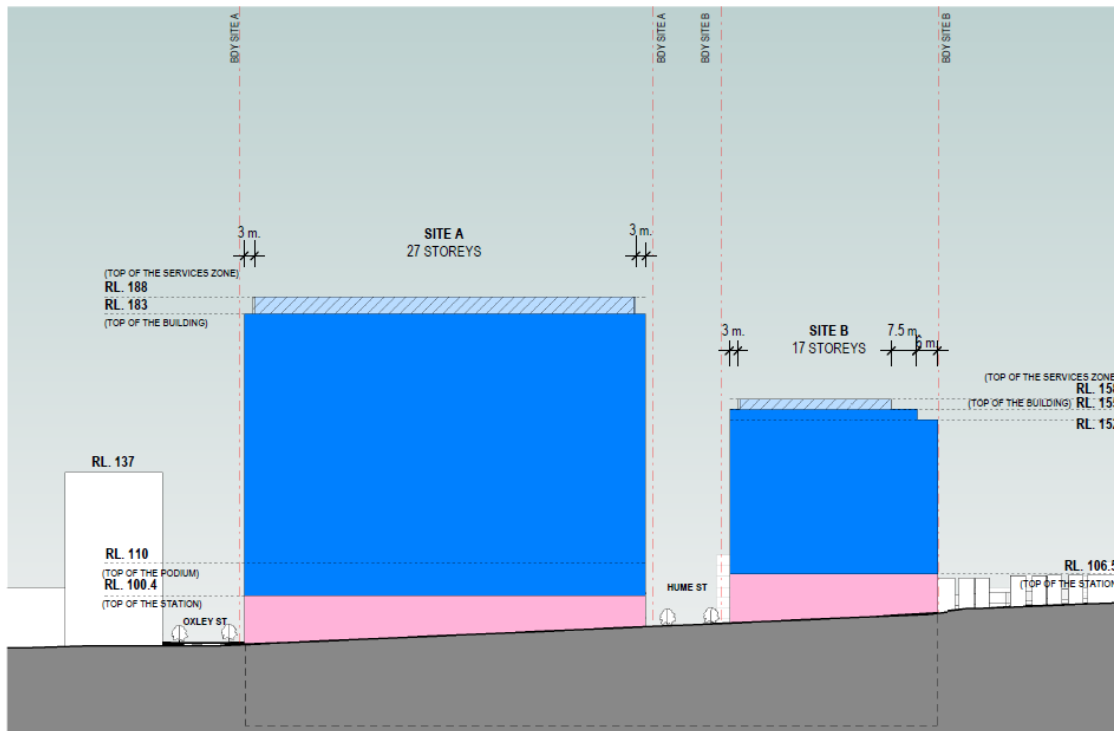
A: Proposed Crows Nest OSD building envelopes – west elevation (Pacific Highway)
